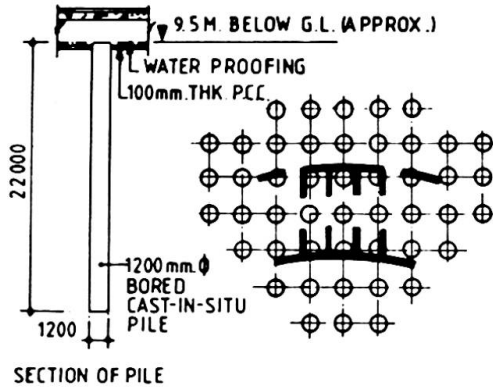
Typical arrangement of piles below lift core Fig.9 Base Raft with shrinkage gaps
